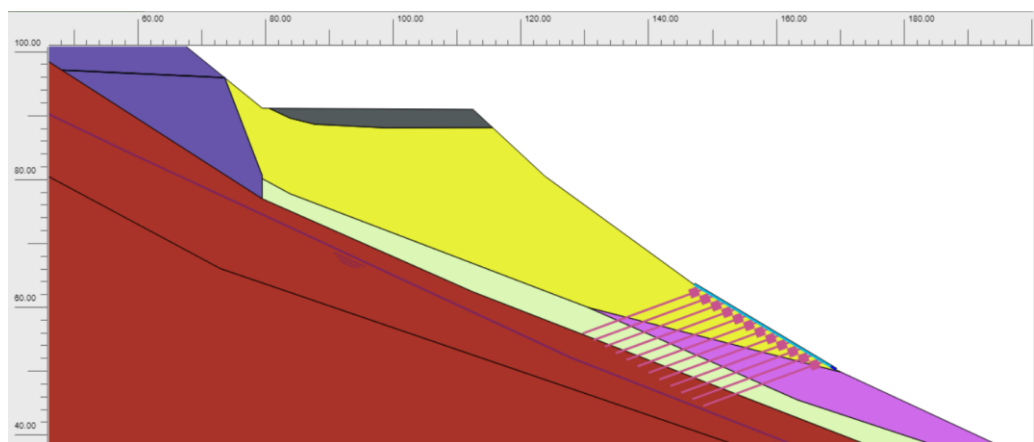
Soil Nail layout with 2.0m spacing and 20 degree inclination
